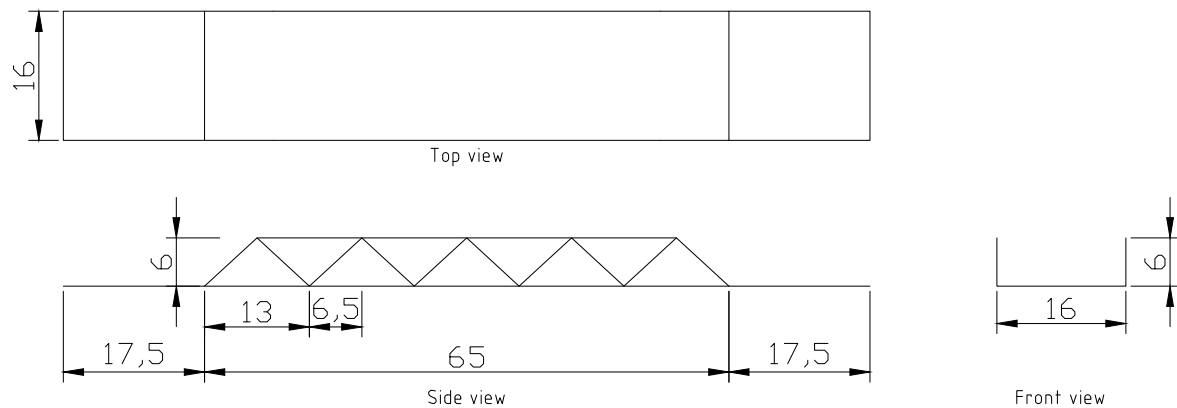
Schematic cross sections in grid lines of the truss beam bridge with girder bridges for the side spans [m]
